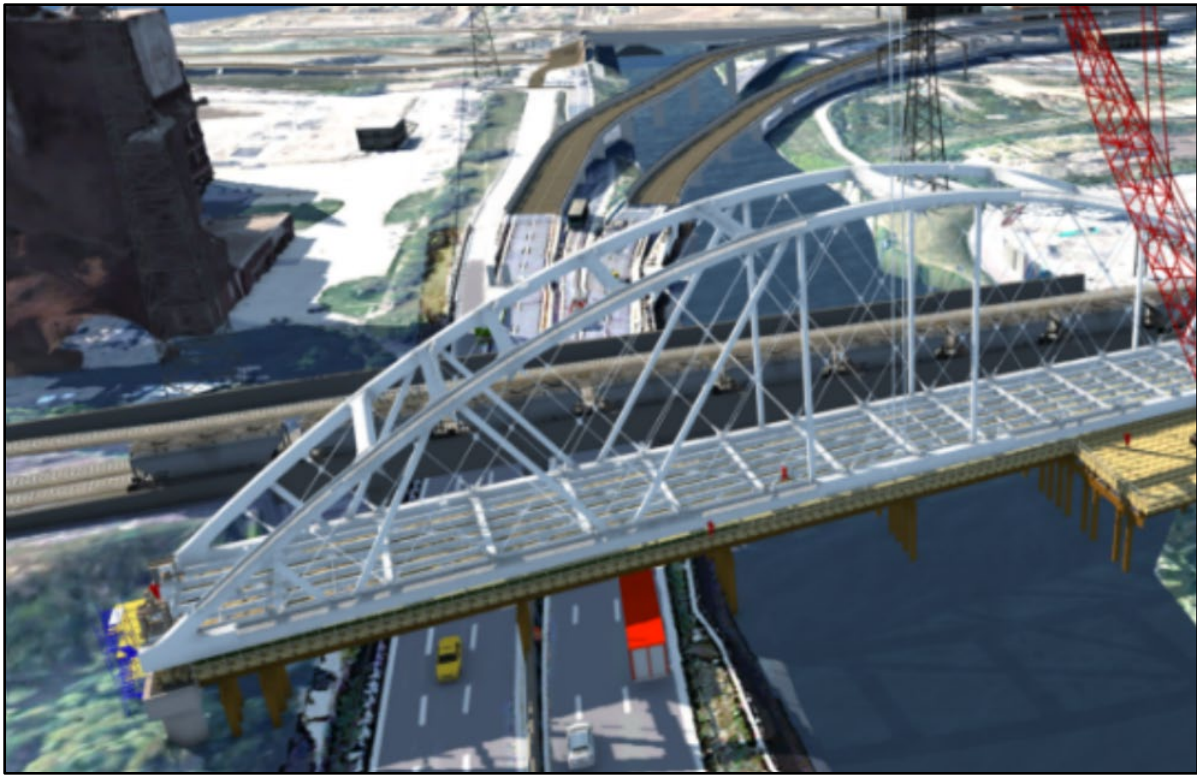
Access Scaffolding over OL Lower Don Bridge
